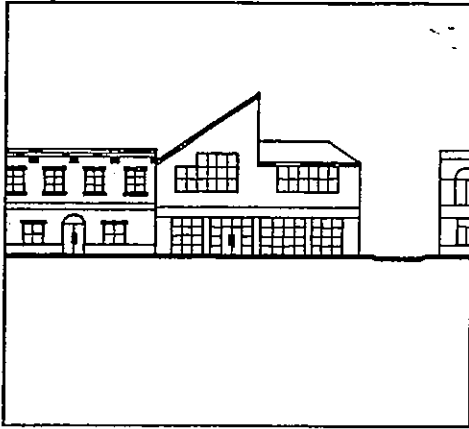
Roof types incompatible with adjacent roof types should be avoided.
